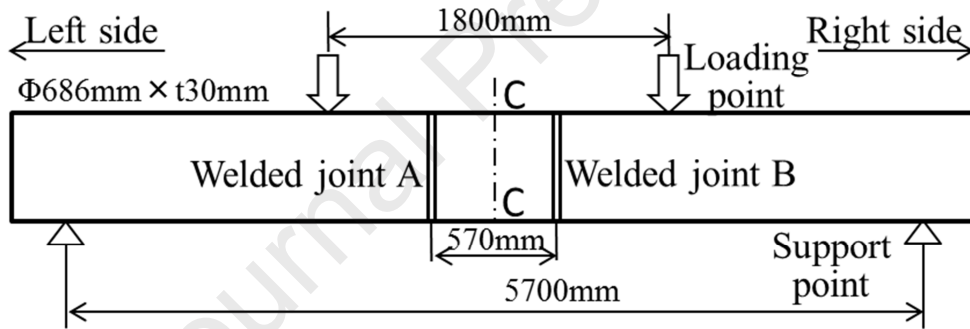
Testing set up of circumferentially welded pipe under inner pressure/axial bending
